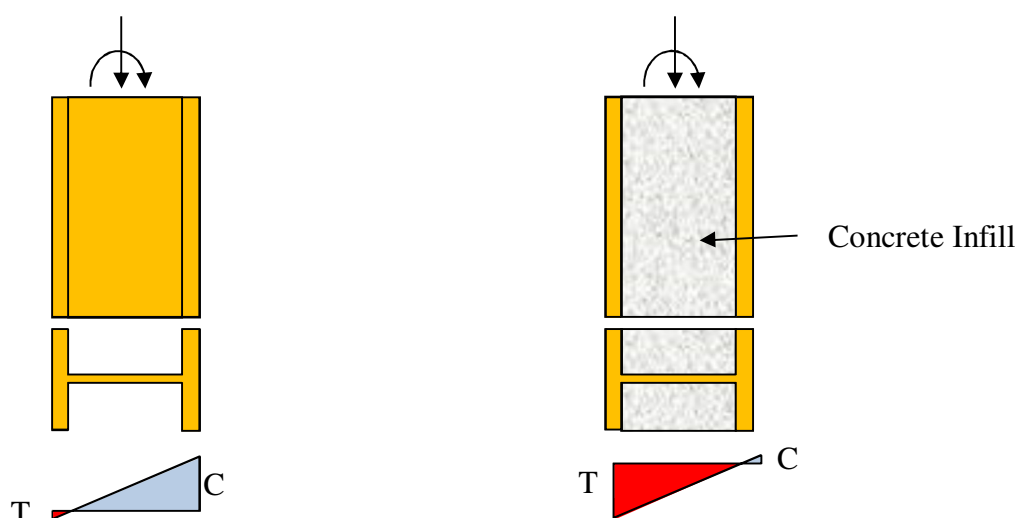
Column and approximate position of neutral axis under high axial force. Left is for the bare steel column and right is the steel column section filled with concrete
